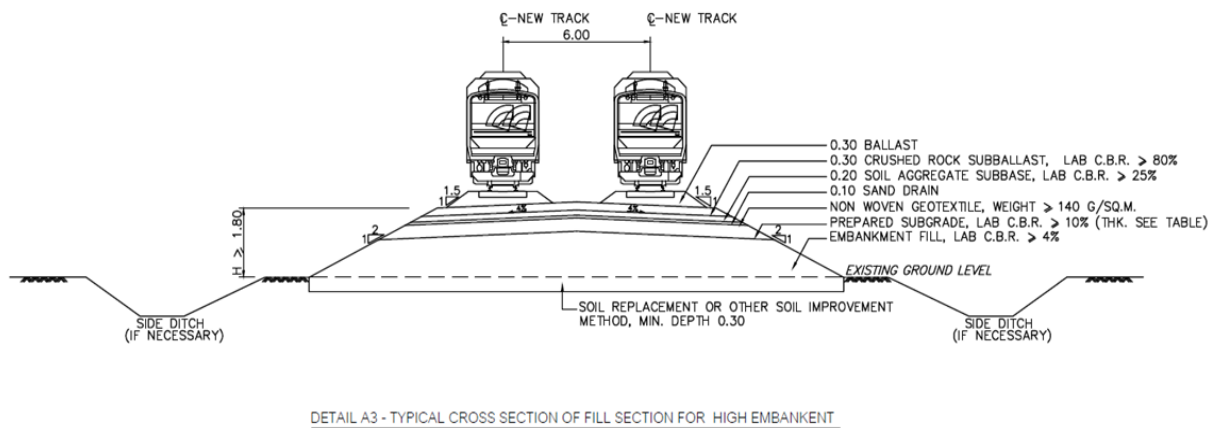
Typical section of embankment: Surat Thani – Hat Yai subsection
